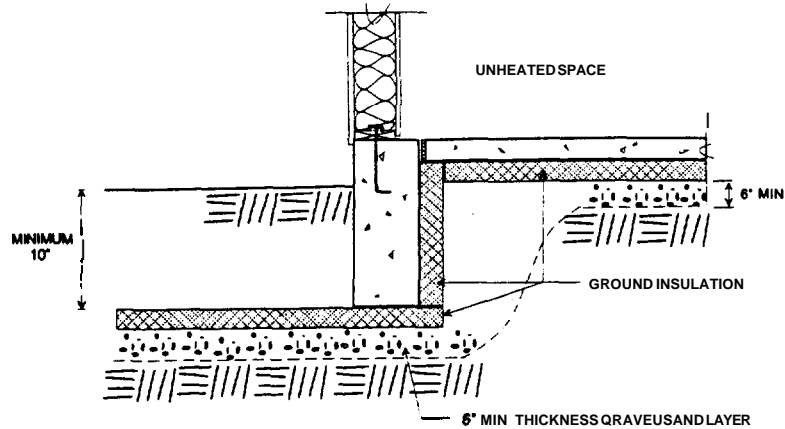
FPSF Design for Unheated Space with Independent Slab and Stem Wall.
